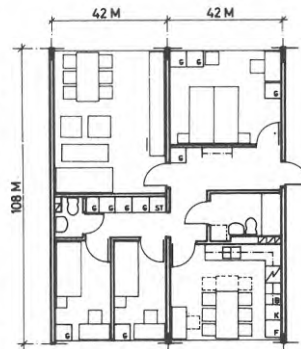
Layout for a floor space of 87 m<sup>2</sup>
